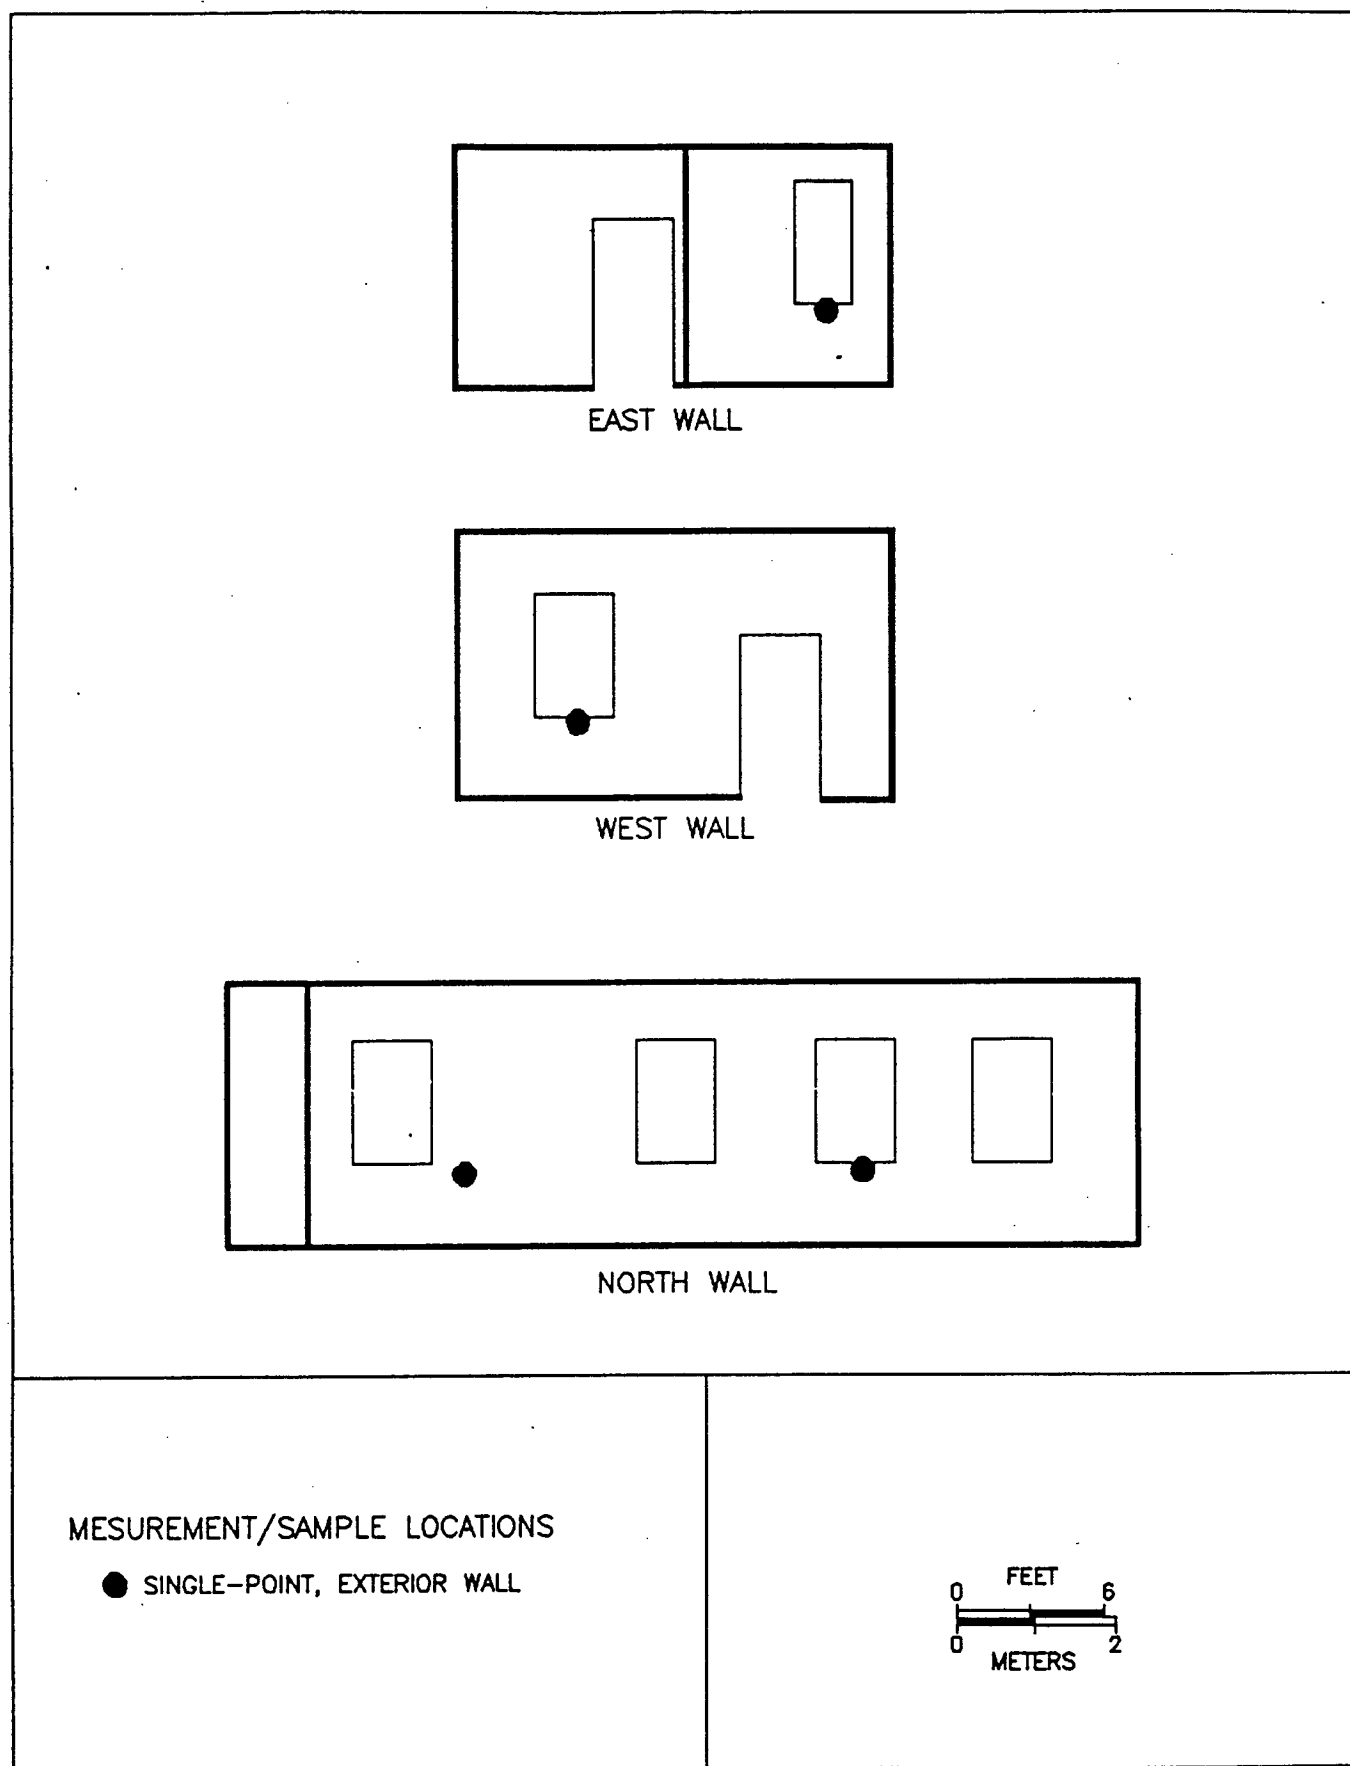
Building 429, Exterior Walls — Measurement and Sampling Locations
